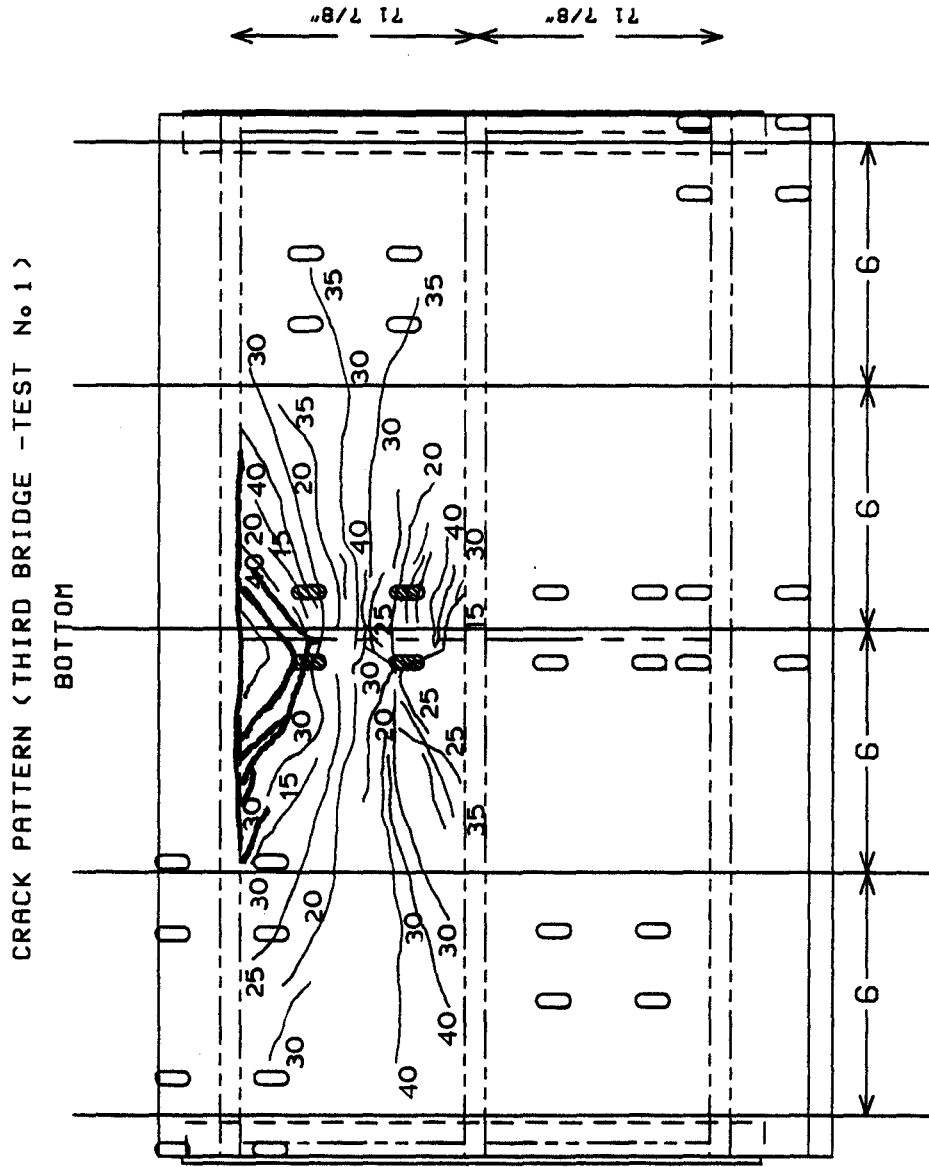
Bottom Cracking Pattern (Third Bridge - Test No. 1)
